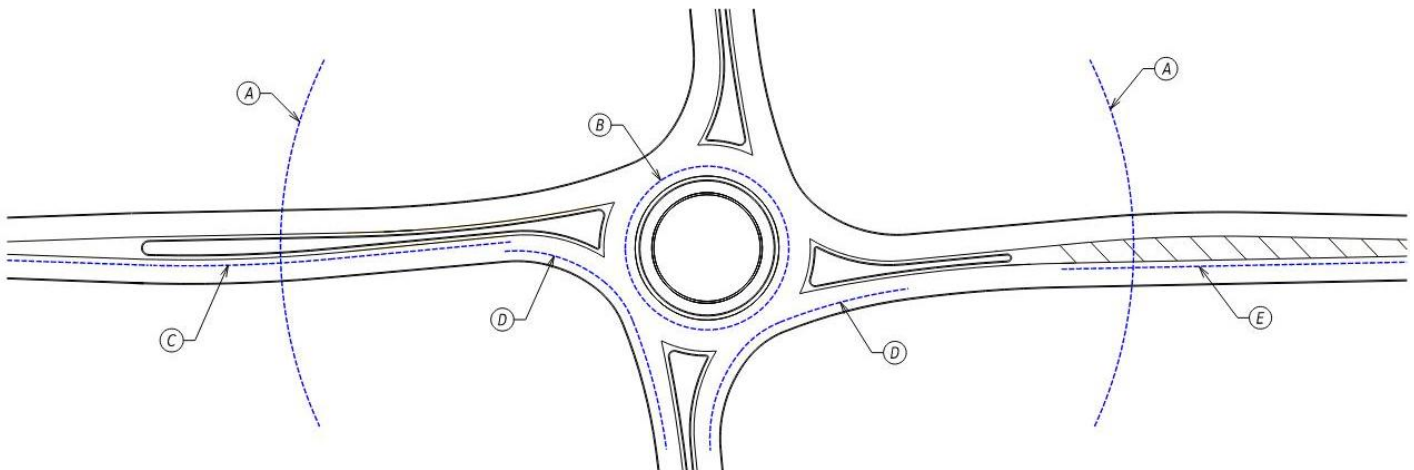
Typical Offsets for a Single-Lane Roundabout
